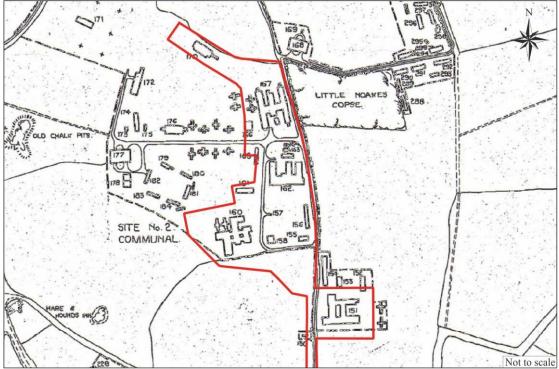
Plan of RAF Membury dispersed sites, 1944; block 8 (building 151) is present at the southern edge of the site (Air Ministry: Drawing 4495/44)
